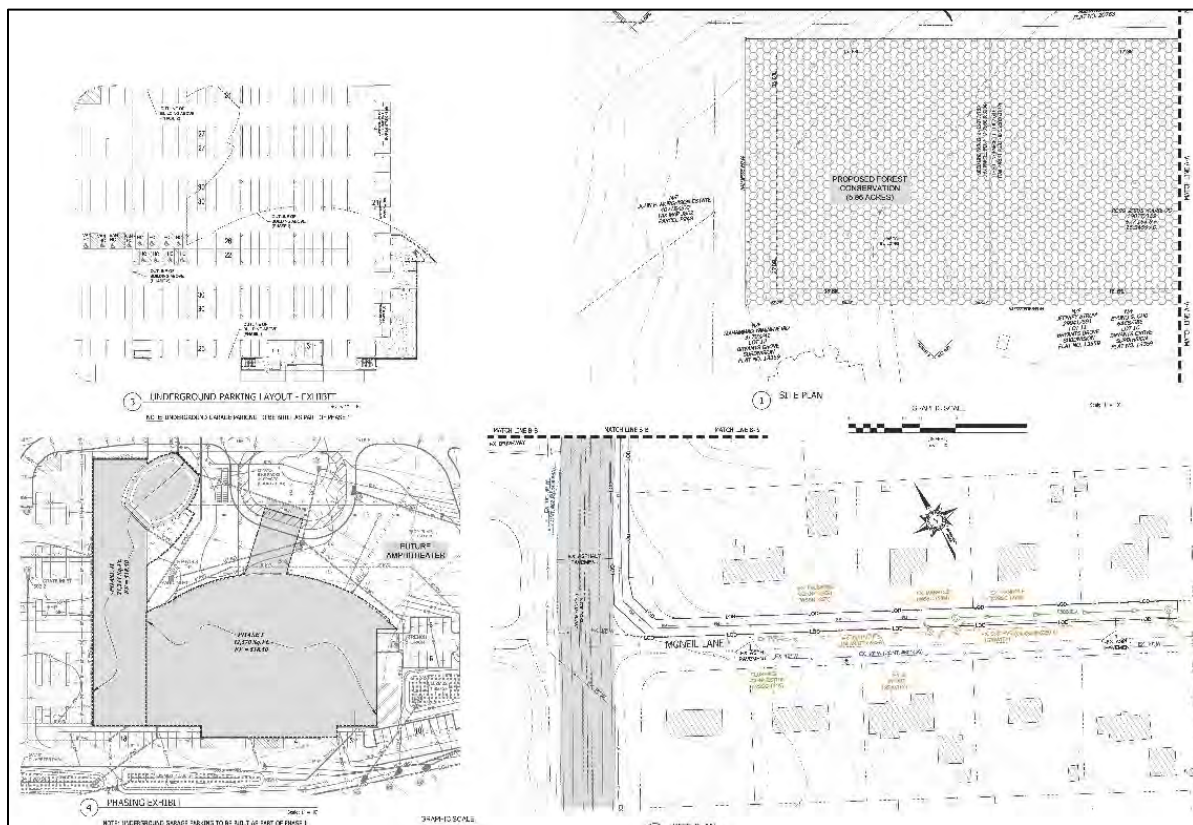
Preliminary Plan, Parking Layout and Sewer Connection
